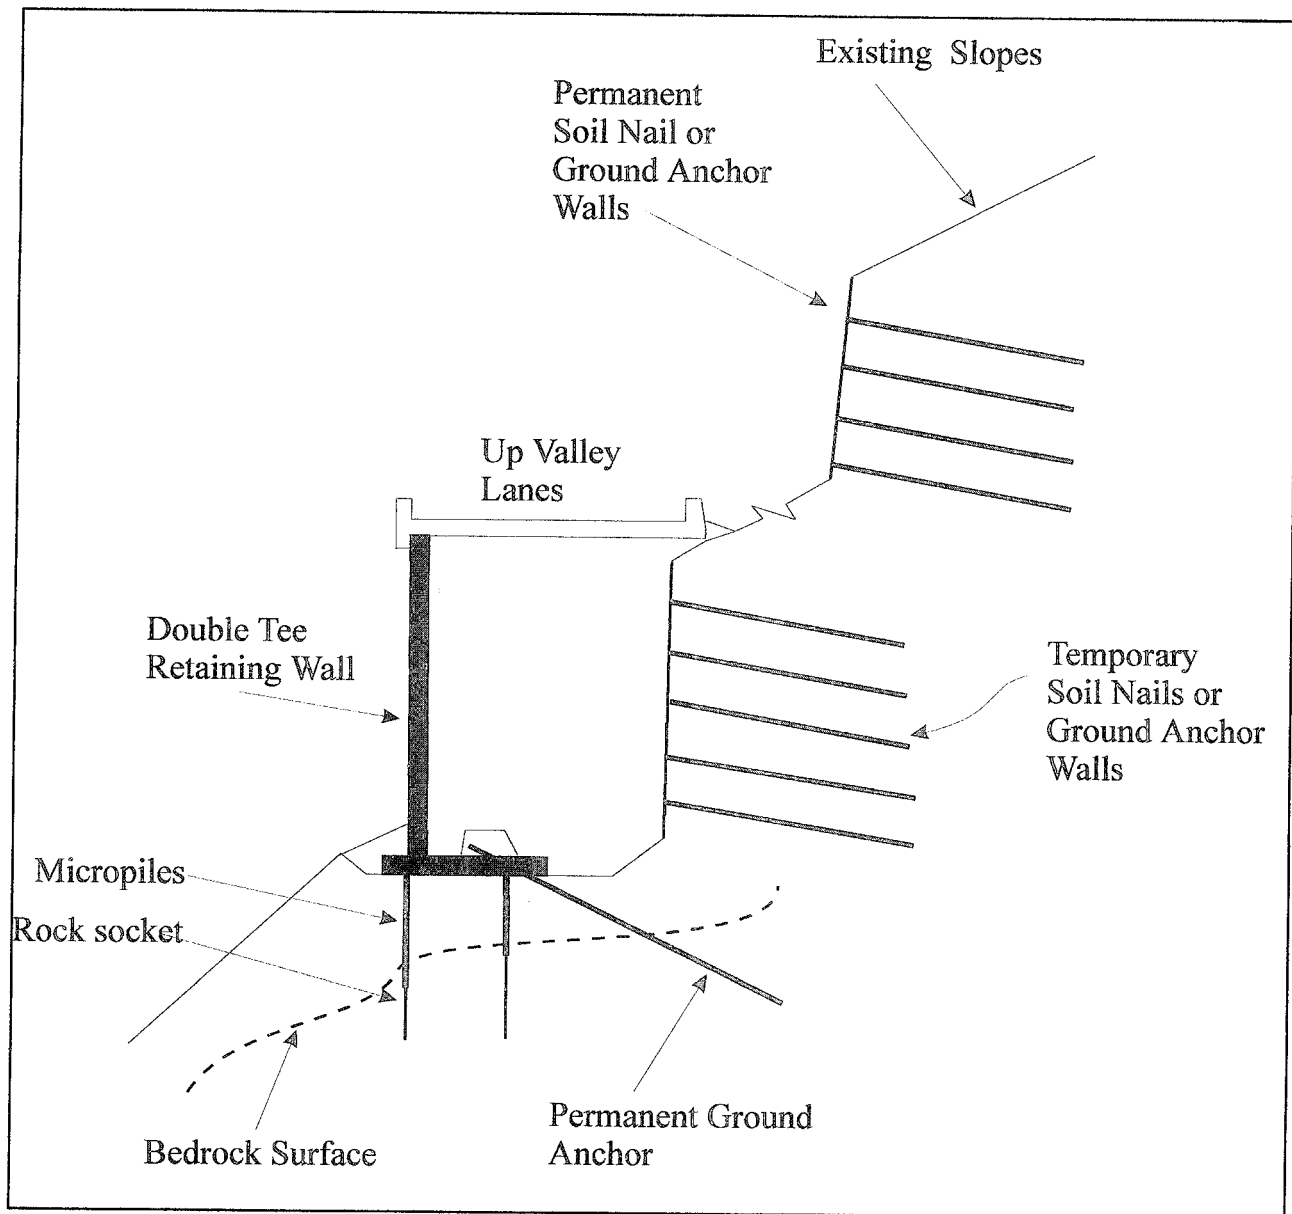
Generalized Profile of Retaining Wall with Micropile Foundation
